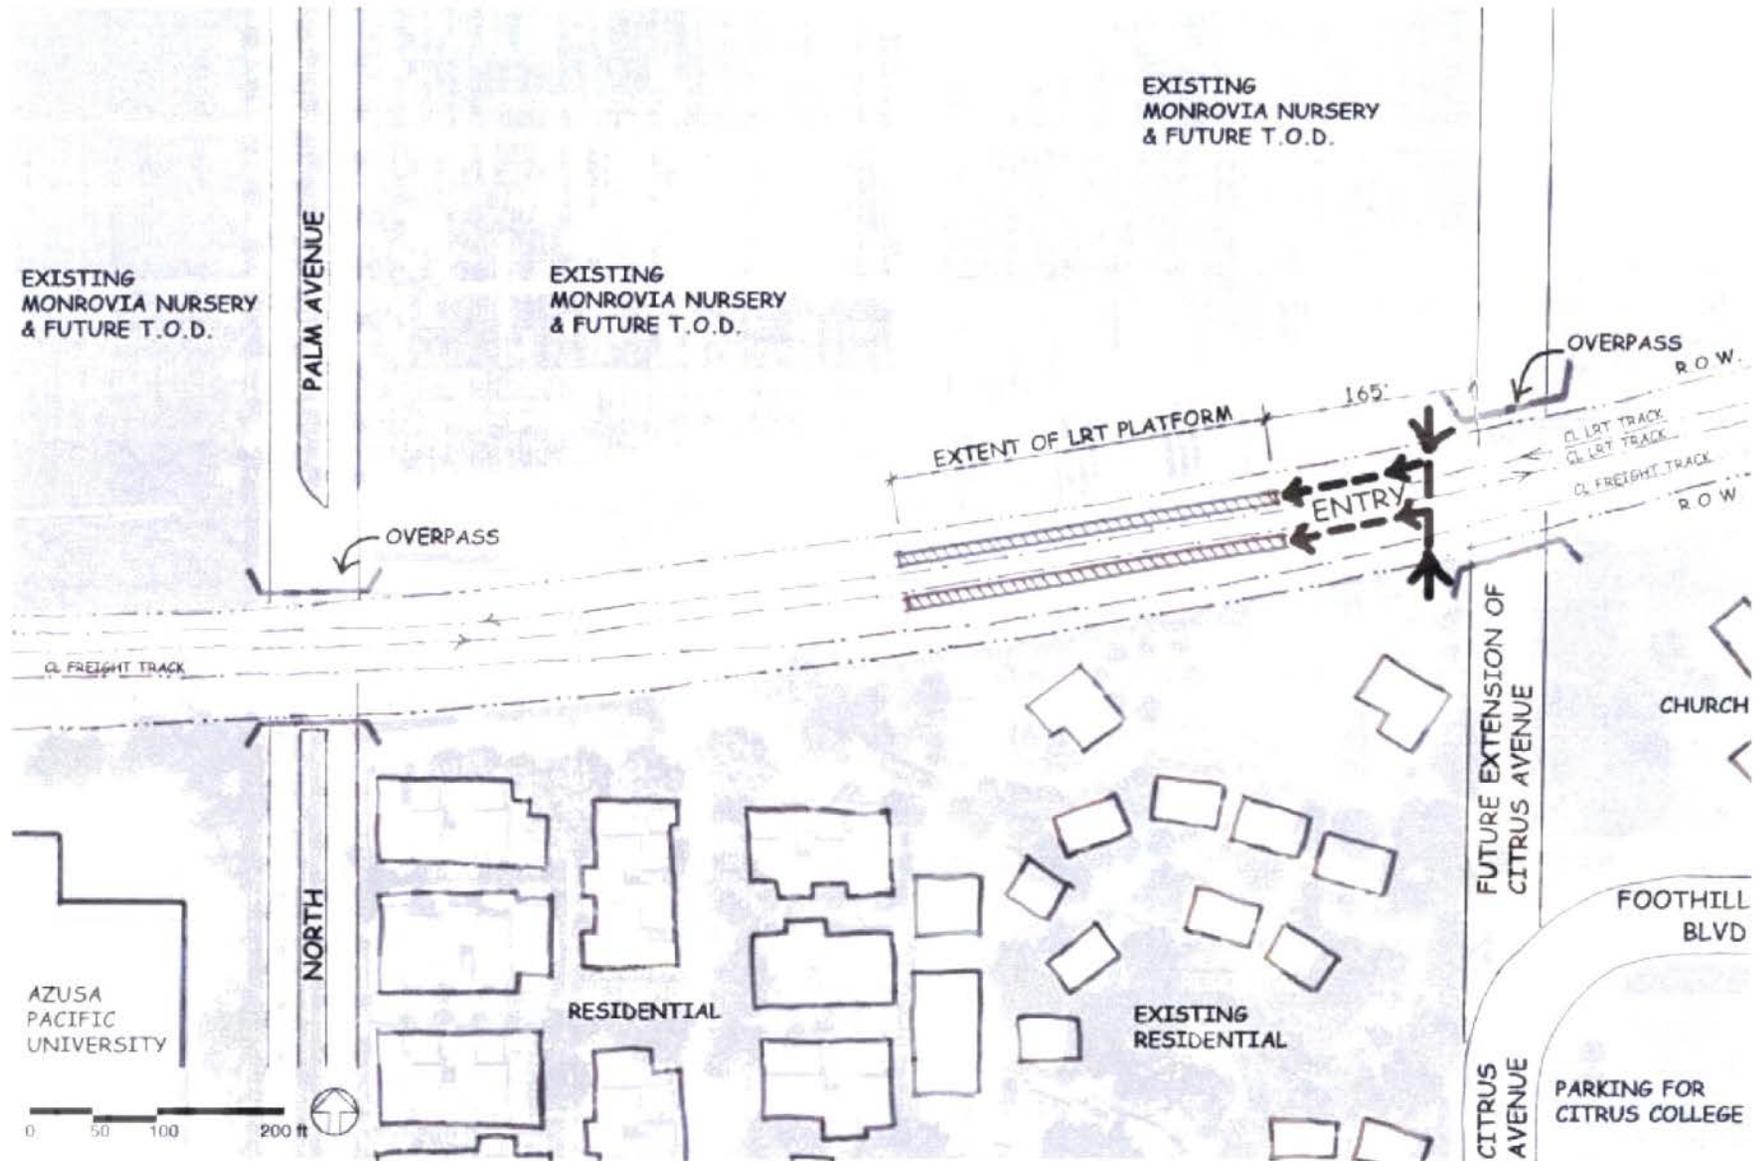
Site Plan: City of Azusa, Citrus Avenue Station
